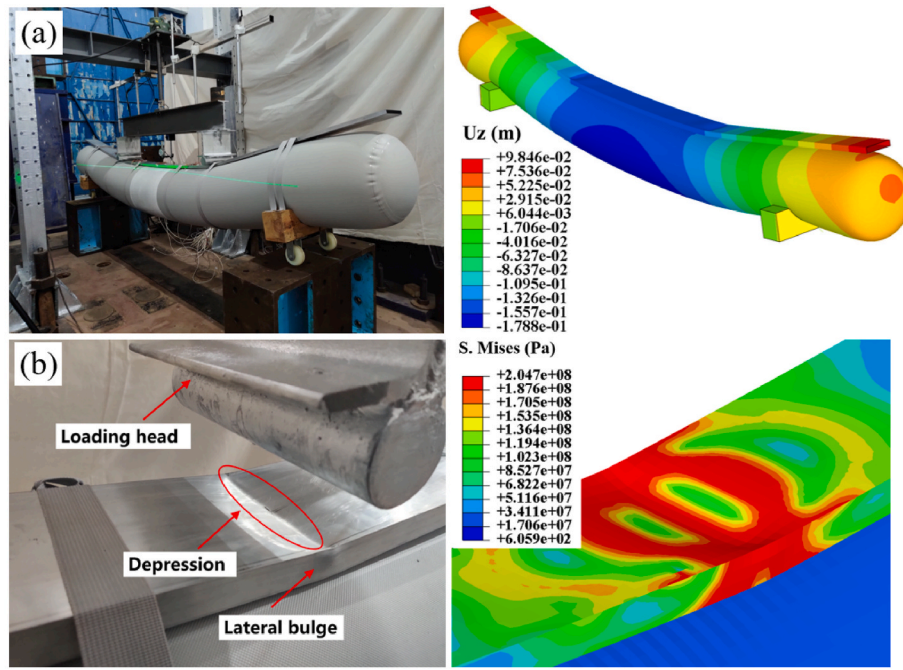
Typical deformed states of the 60 kPa specimen: (a) Global deformed pattern; (b) Local structural failure.
